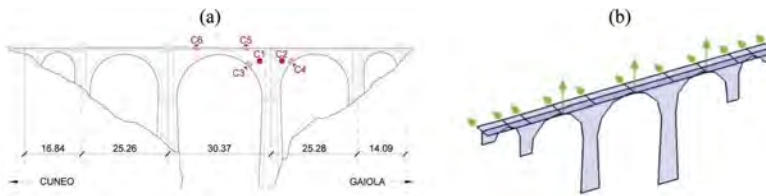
(a) Layout of the samples coring; (b) Sensor layout adopted for the AVTs.
